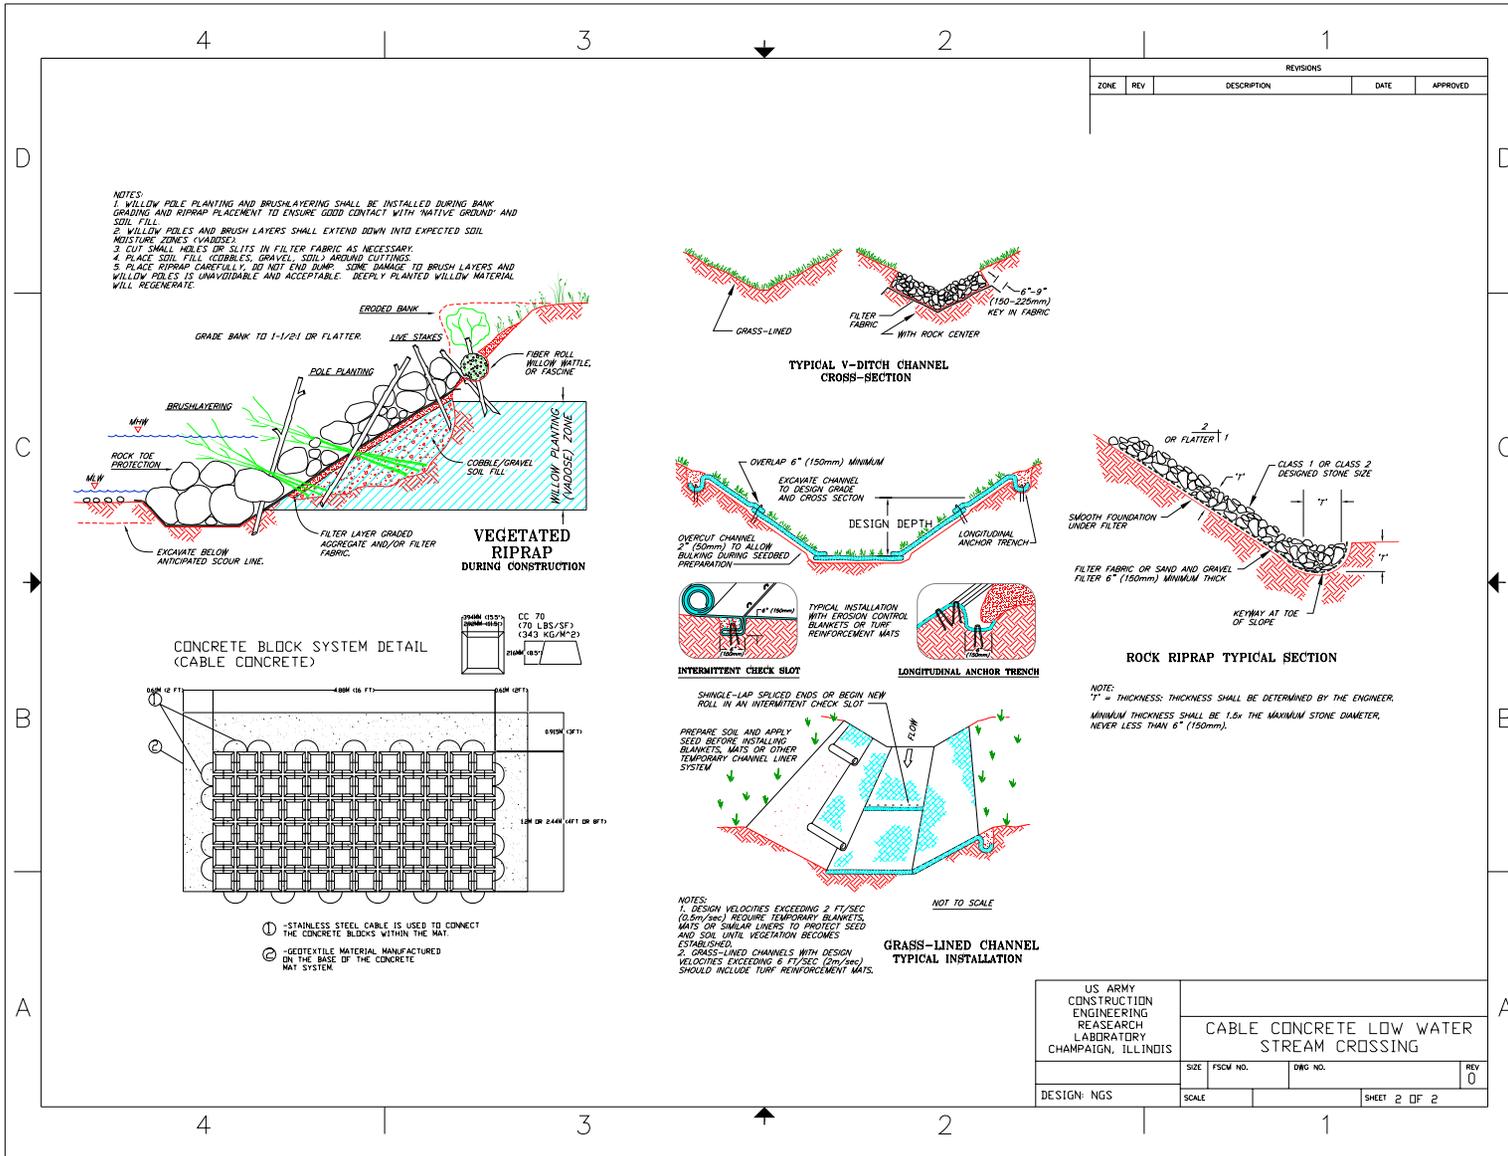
Low water stream crossing using cable concrete (sheet 2).
